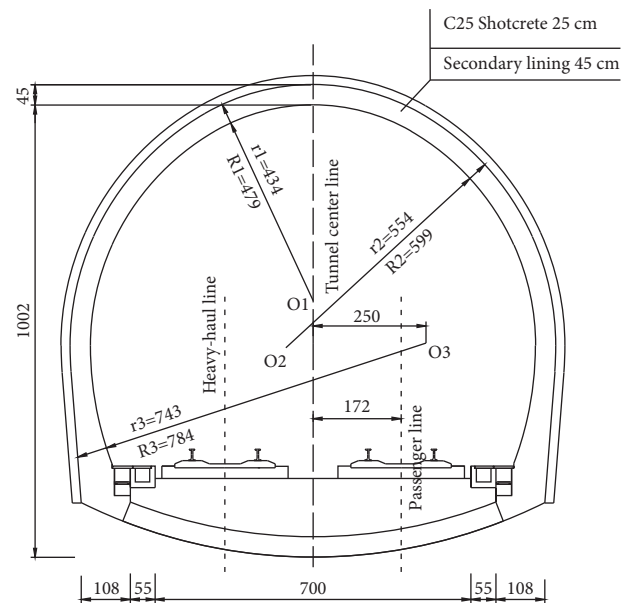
Cross section of design lining of double-track heavy-haul railway tunnel (unit: cm).
